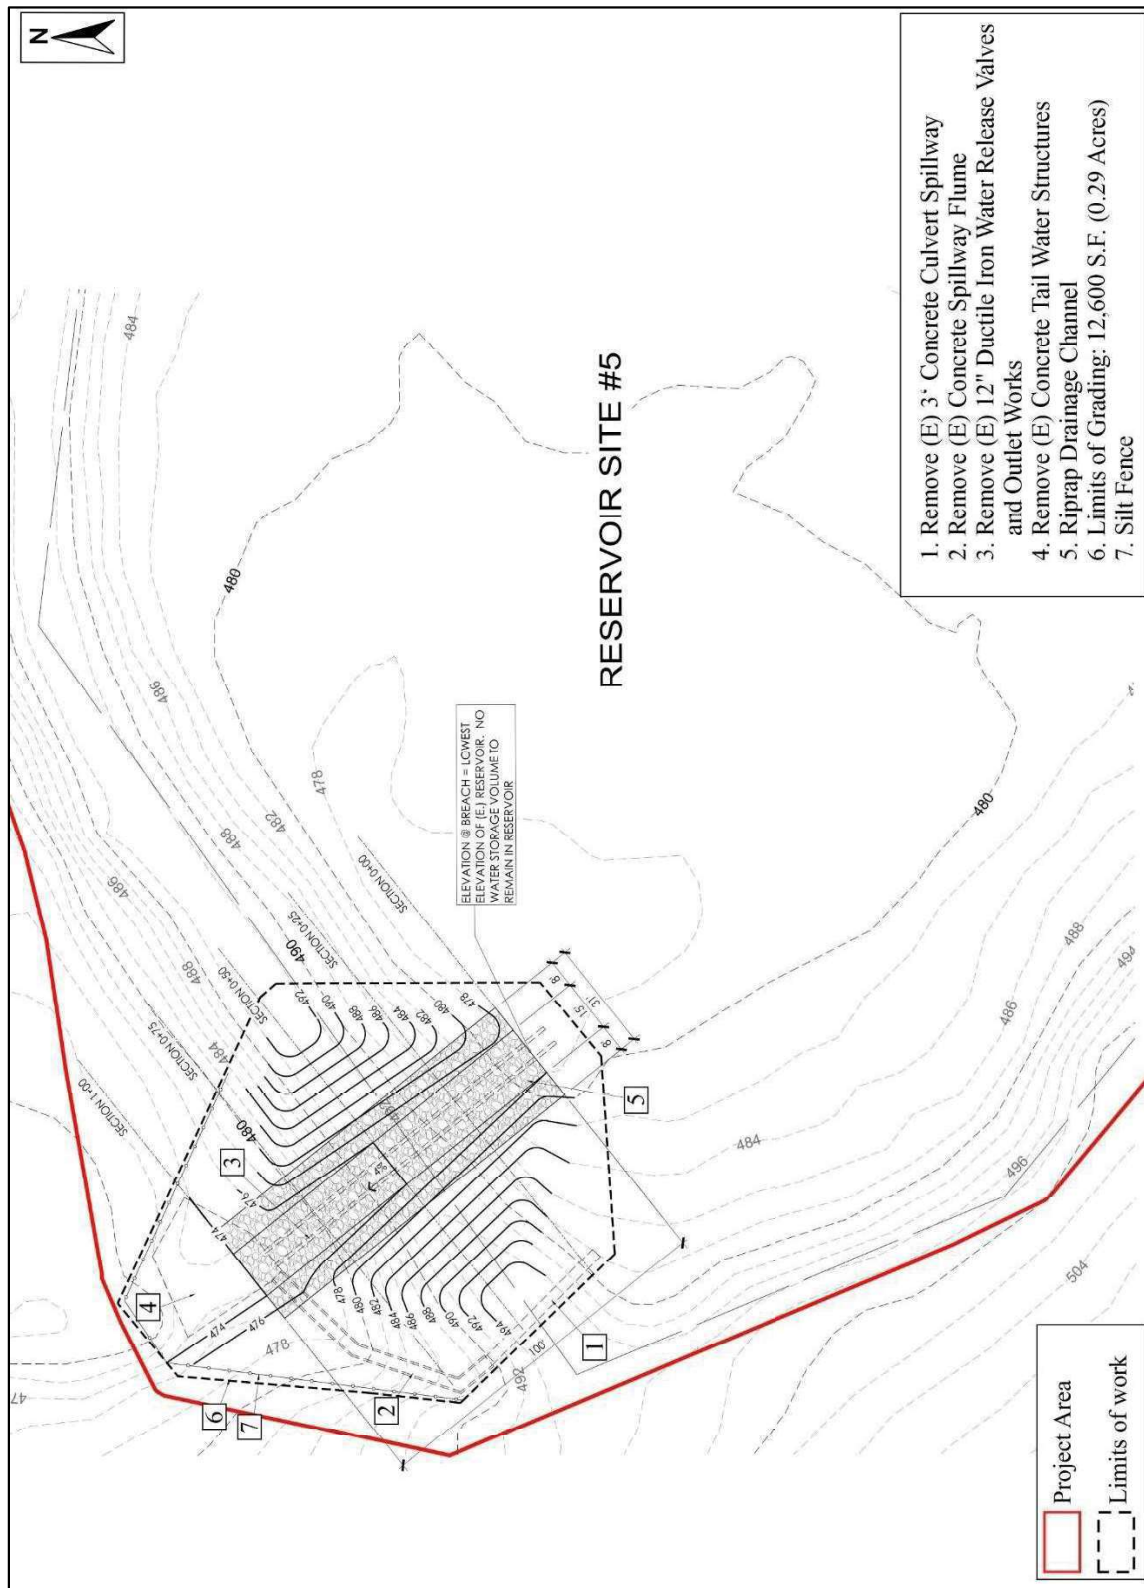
Proposed project plan of breaching the northwest embankment (AIS, ASM Affiliates, revised July 2023).
